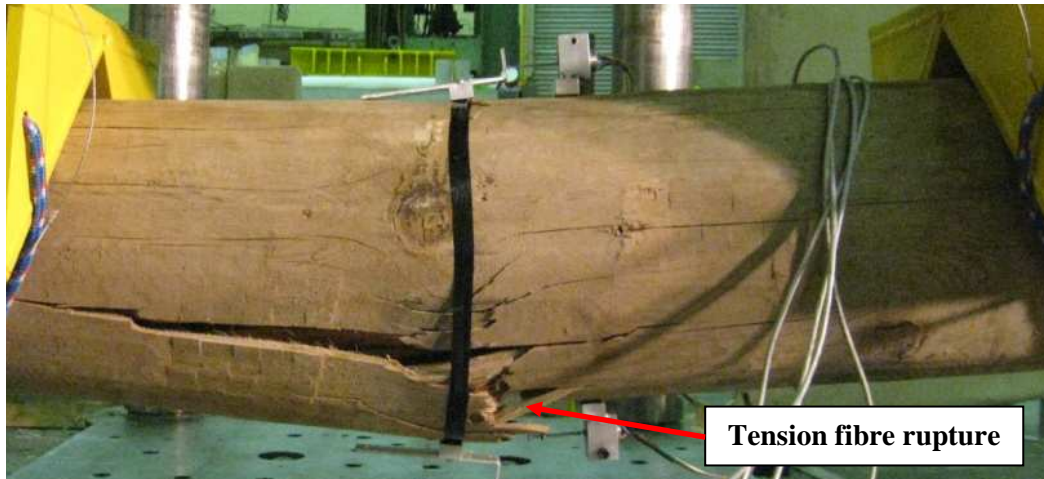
Tension fibre rupture of new pole specimen with tension damage (60-2-1).
